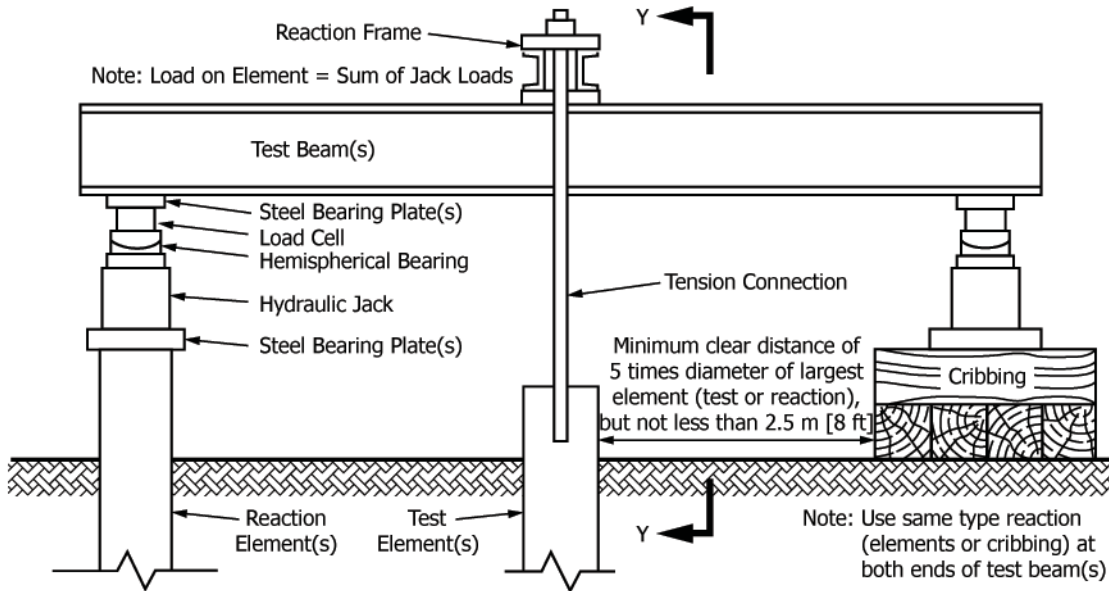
Typical Setup for Load Test Using Hydraulic Jacks Acting Upward on Both Ends of Test Beam(s)
